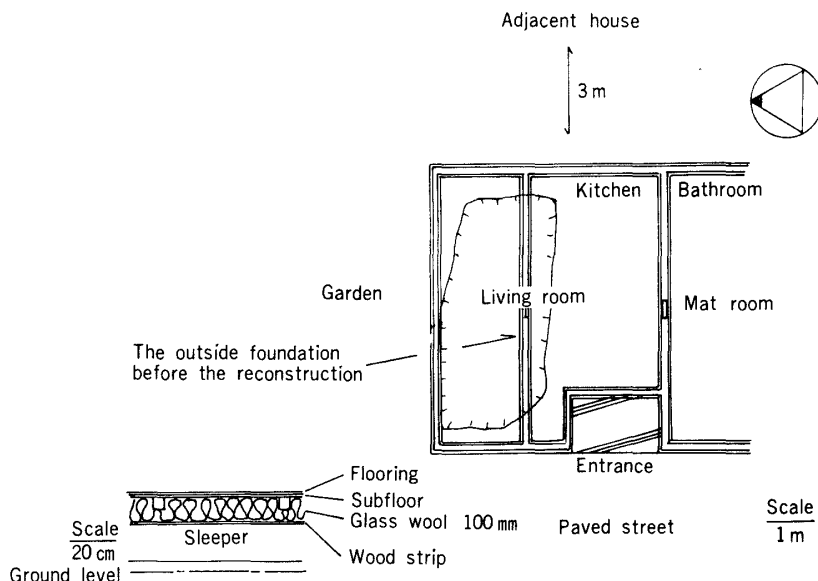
The foundation plan and the details of the floor constitution (Case 8).
